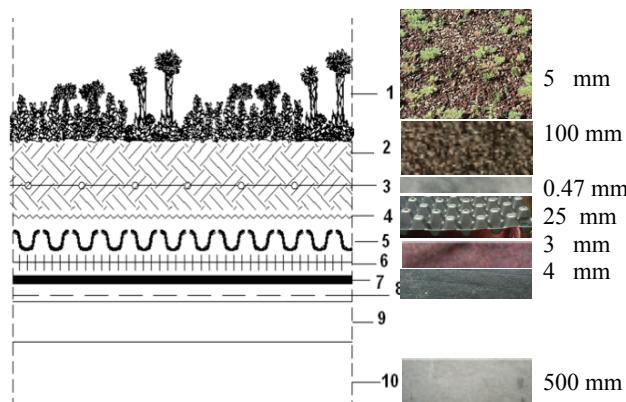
Extensive green roof with sedum plants and twin reference roof; Layers for green roof (* Elements constituting the SEIC green roof system): 1.Extensive vegetation – Sedum; 2.SEIC extensive substrate - growing medium; 3.Optional anchoring system for tilted roofs; 4.MediFilter MF1 - filtering mat; 5.MediDrain MD 25 – drainage element; 6.MediPro MP300 - root protection fabric; 7.Waterproofing root barrier membrane; 8-9-10.Structural elements
